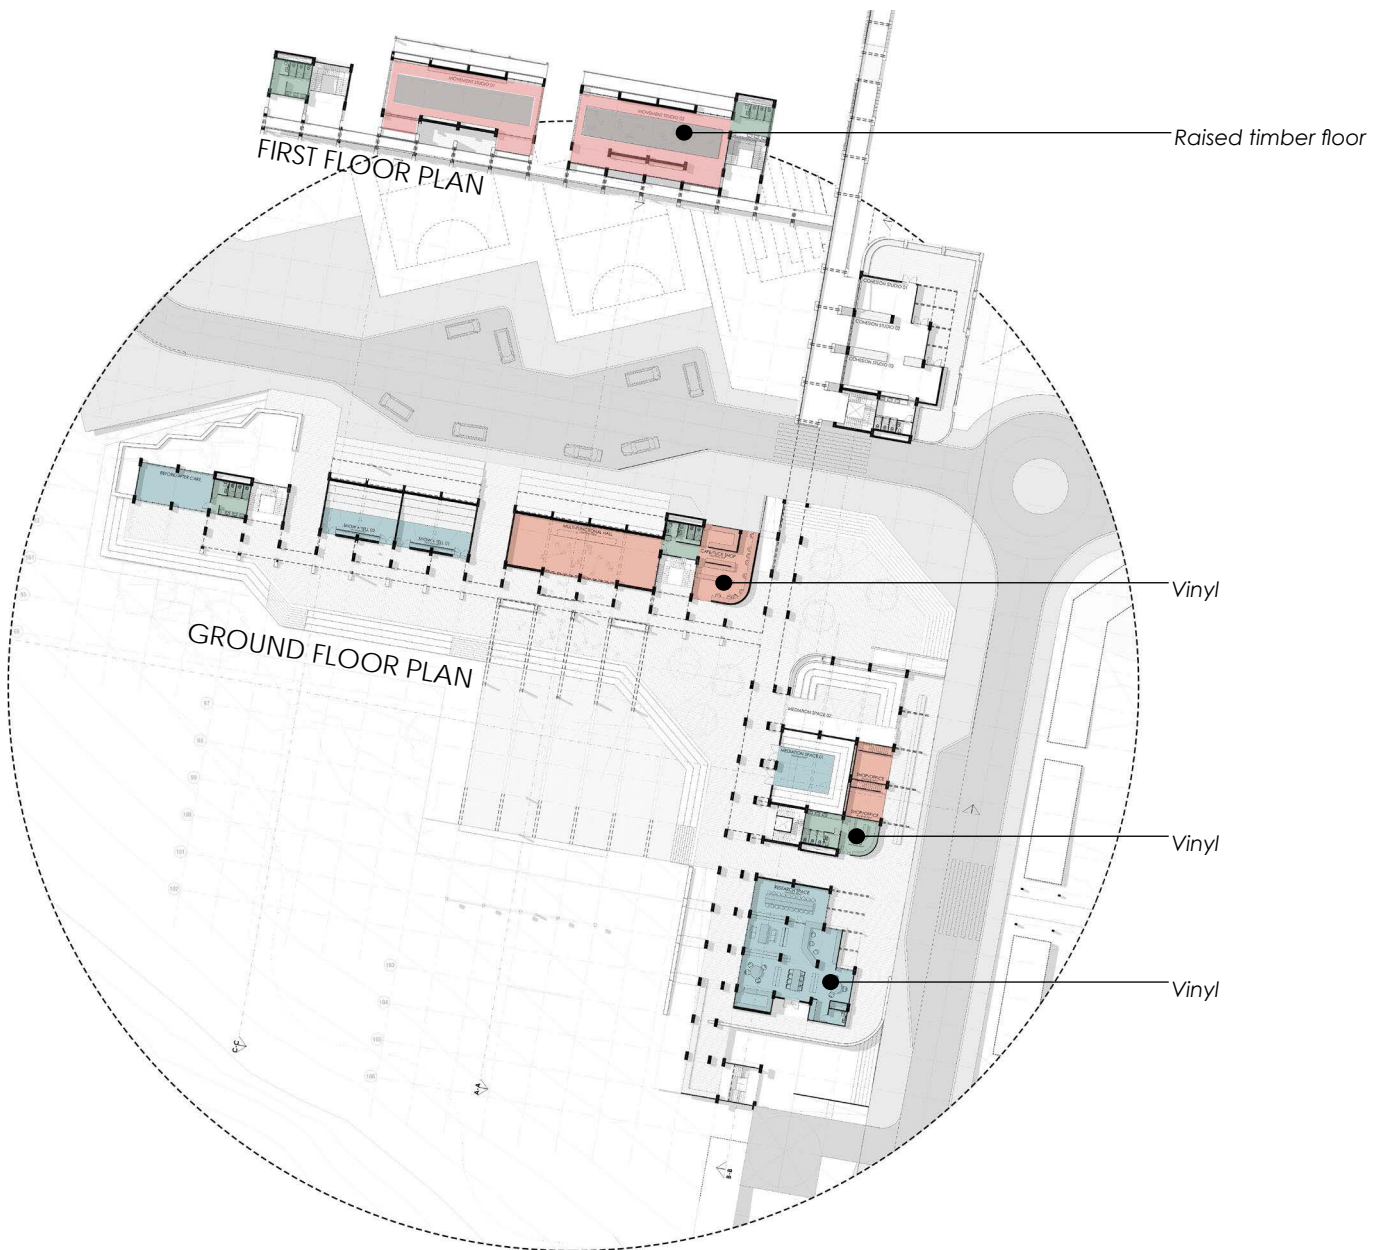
Proposed material palette for the roof covering, ceilings and internal surfaces : finishes (Author, 2018)
